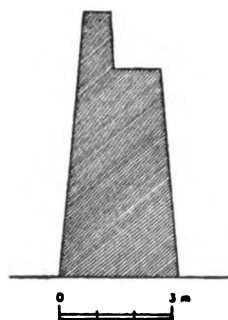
Section of the brick wall of the fort in the ruined site 86.
